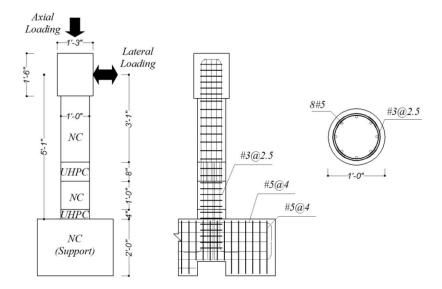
Specimens S-2.5-10, S-4-10, S-2.5-20 typical dimensions and reinforcement details.
